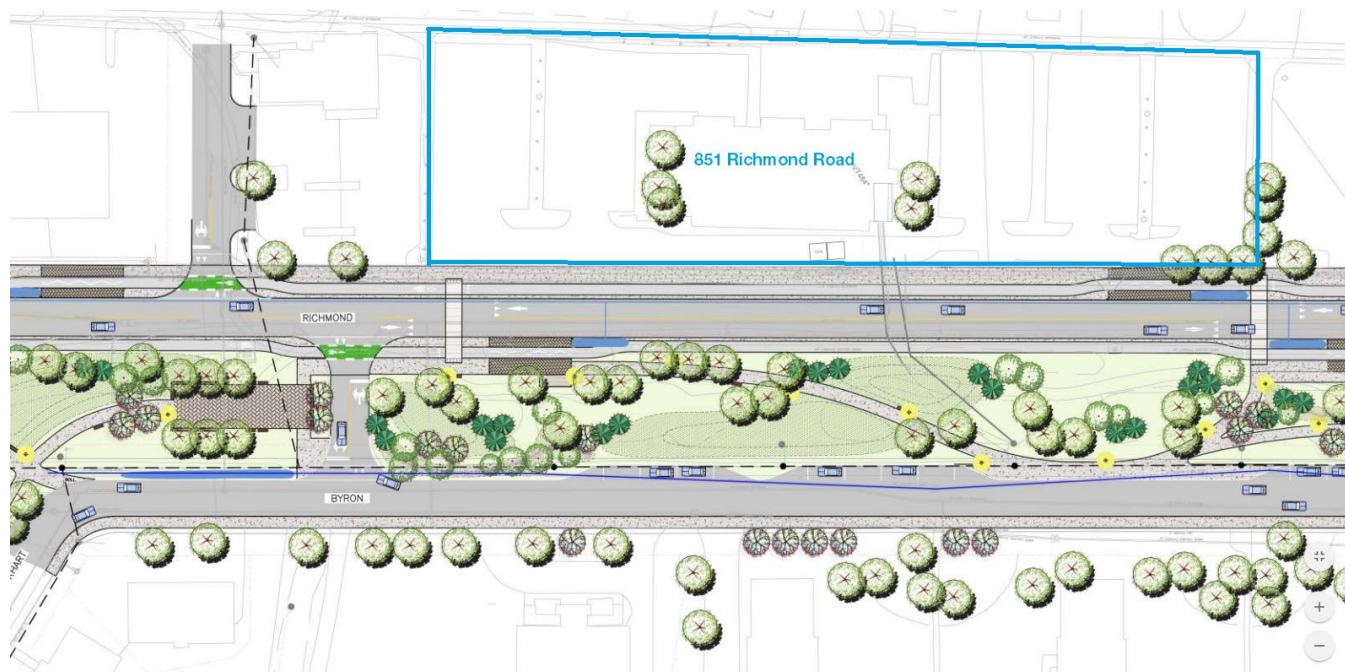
Richmond Road and Byron Corridor Function Design Plans
